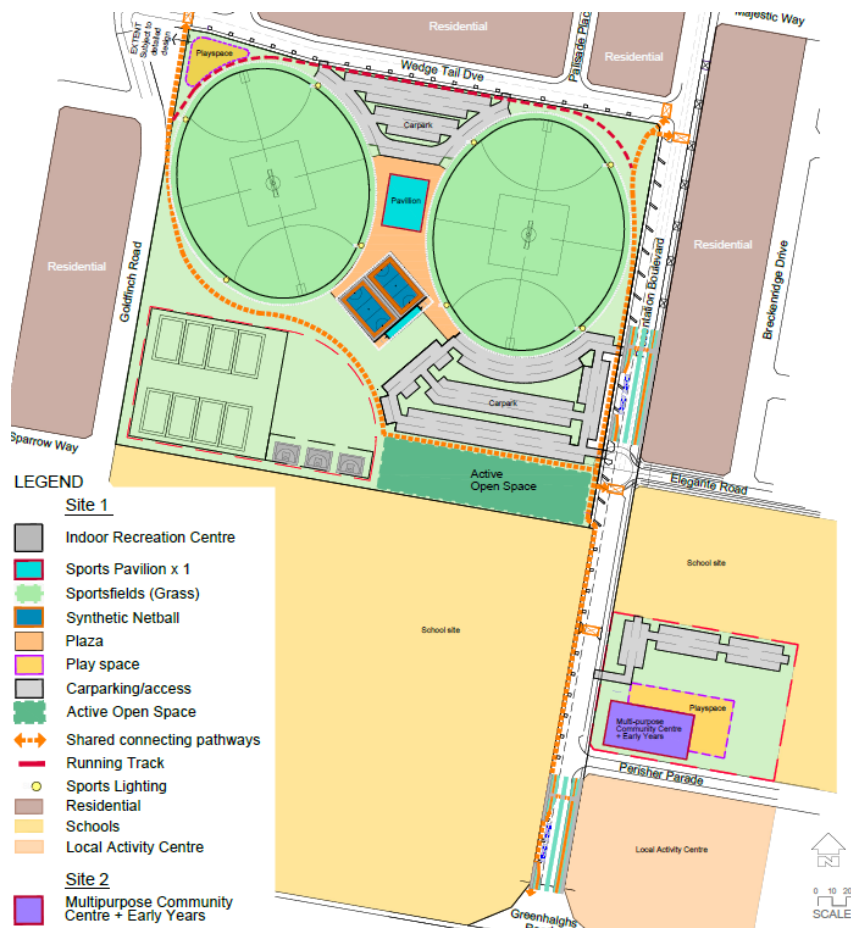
Greenhalghs Road LAC Community Facilities Concept Plan
